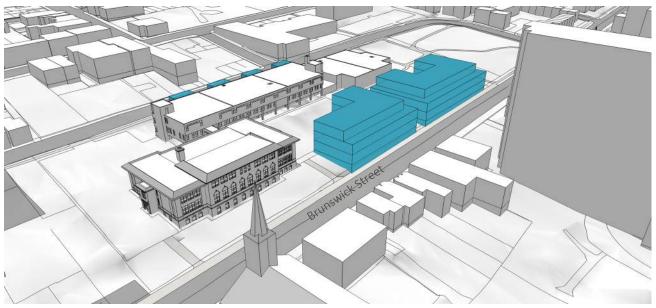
St. Pat's site fter construction of phase two (New building envelopes shown in blue)
